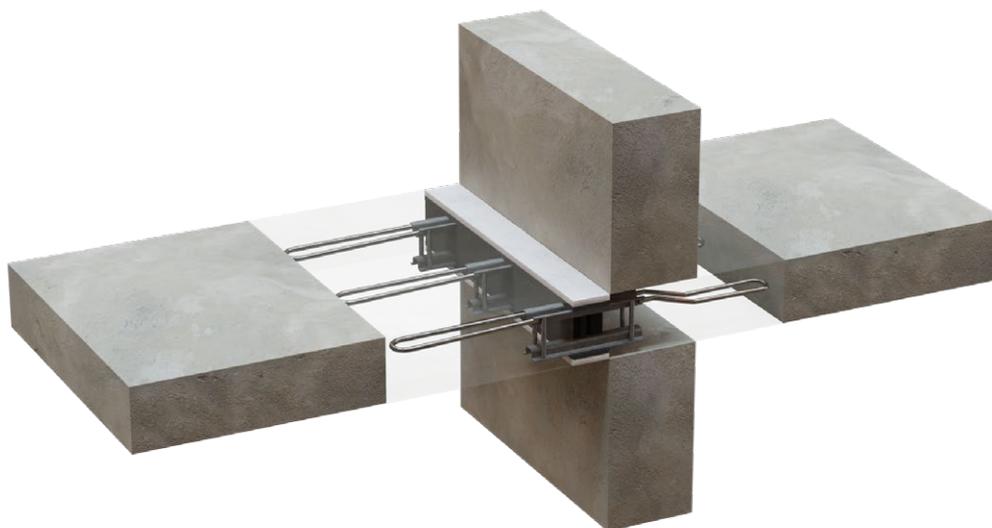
The TIPOMEGA® connector anchored in the floor slab using U2-shaped bars welded to the upper profile
